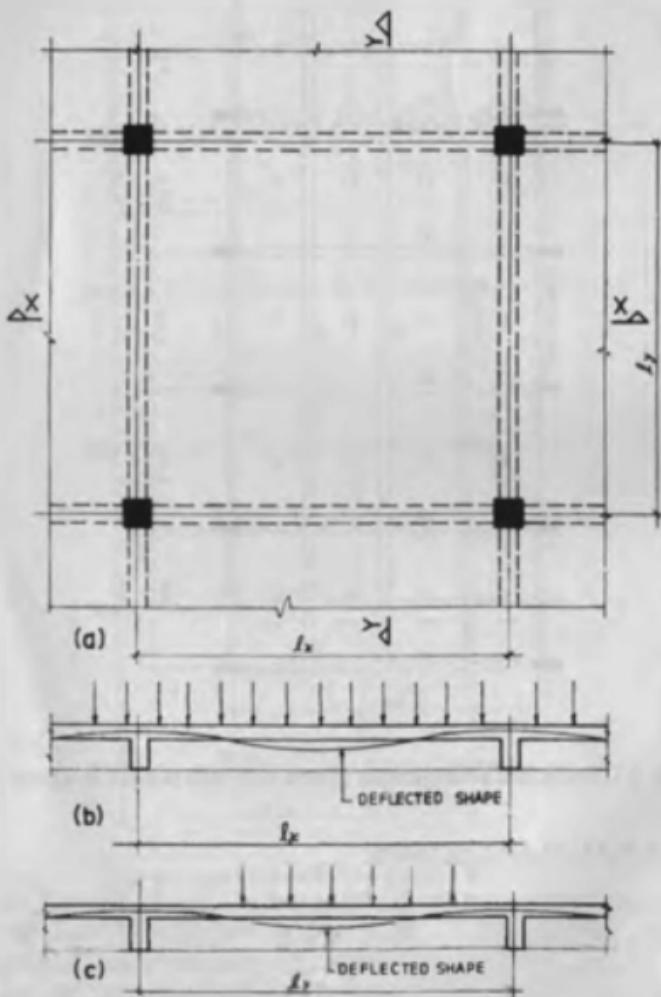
Two-way slab panel in plan. (a) Plan of slab panel. (b) Section X-X; (c) Section Y-Y.
